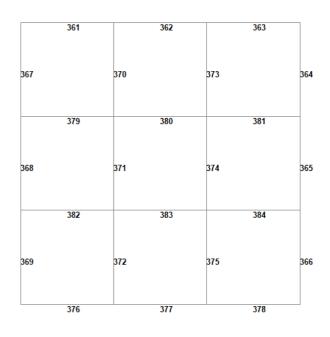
FIG:-FIG SHOW FLOOR LEVEL BEAM FORCES
